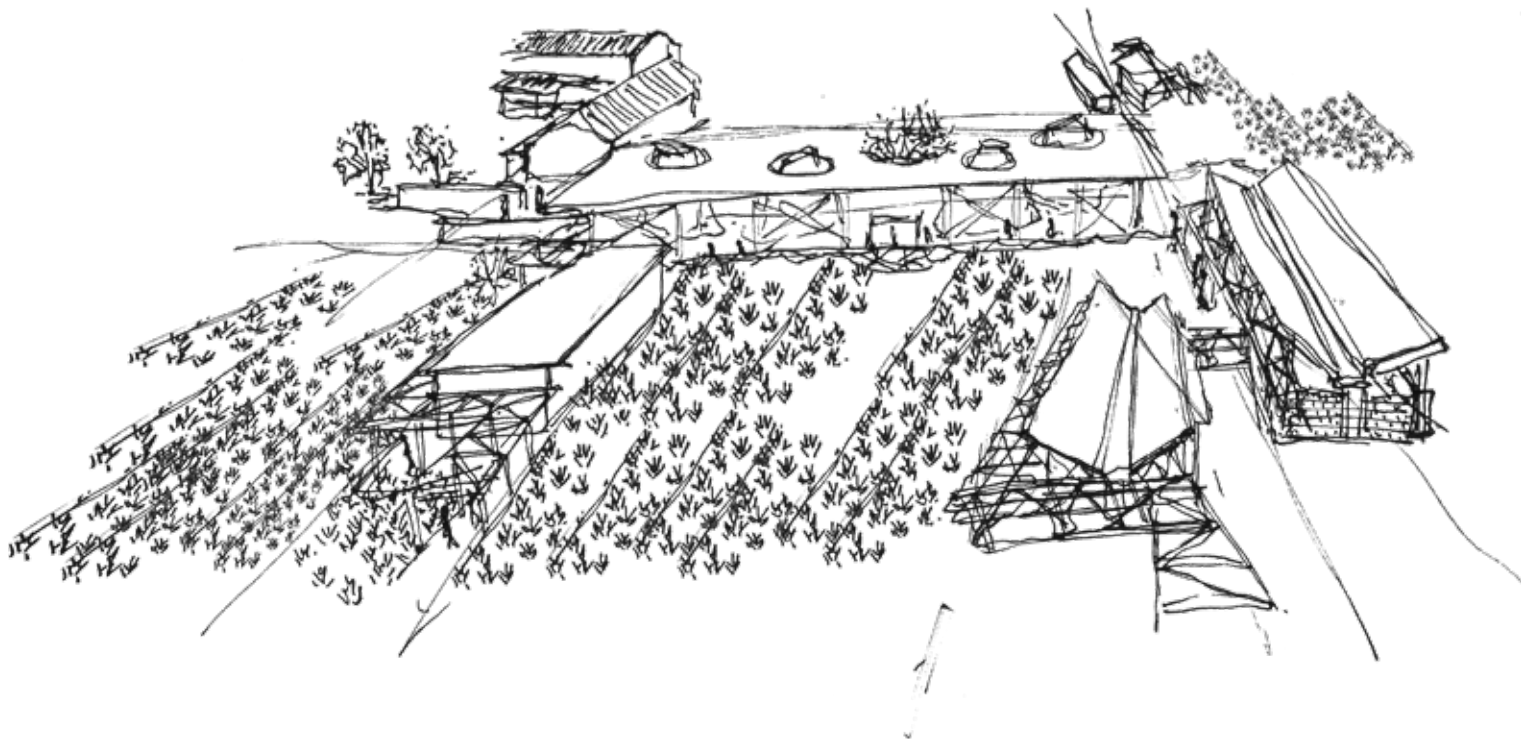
Final design development: Africa Silks assemblage (Caldeira, 2019: drawing).
